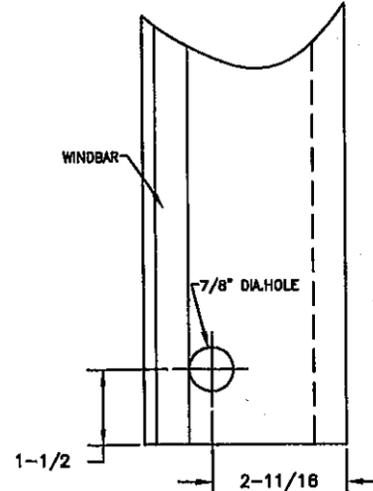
DETAILS FOR WELDING "E" GUIDES TO STEEL JAMBS
